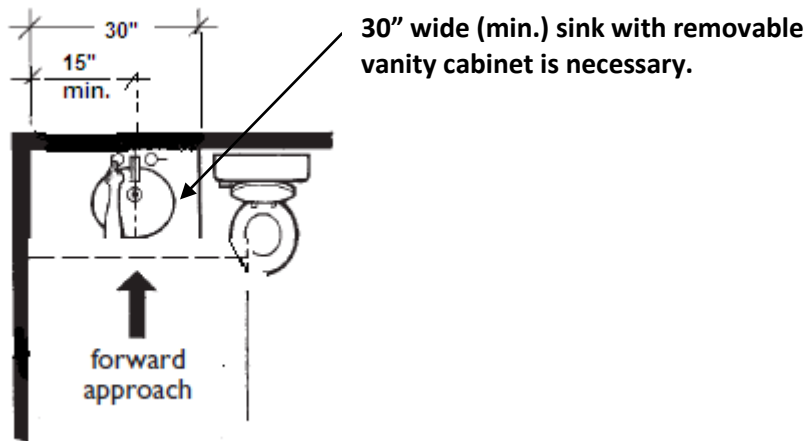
Knee Space Must Be Provided Because Clear Floor Space Cannot Be Centered
